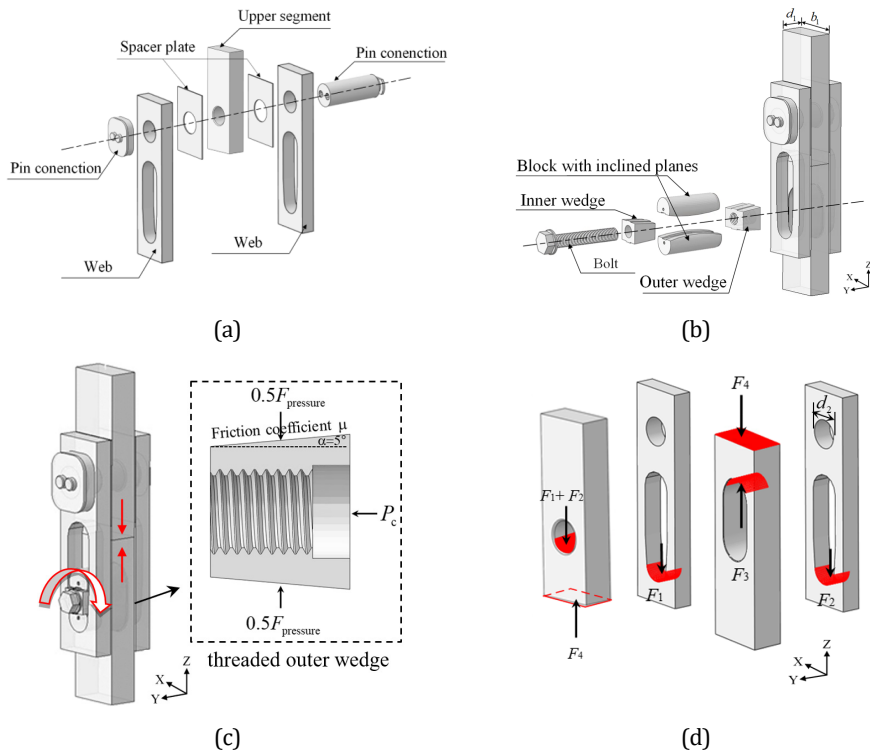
Schematic views of tower segment with the C1 wedge connection in the study. (a) Pre-assembly of the pinned connection; (b) Assembly of the upper part and lower flange fastener; (c) Preloading of the bolt; (d) Contact forces/surfaces after bolt-pretension
